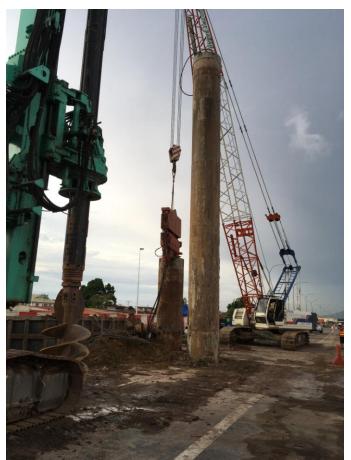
Installation Temporary Casing by 7 tons Double Jaws Vibro Hammer
